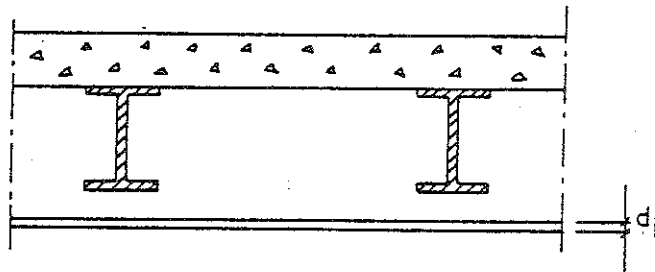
Floor structure, composed of a reinforced concrete slab, load-bearing steel beams, and an insulating ceiling
